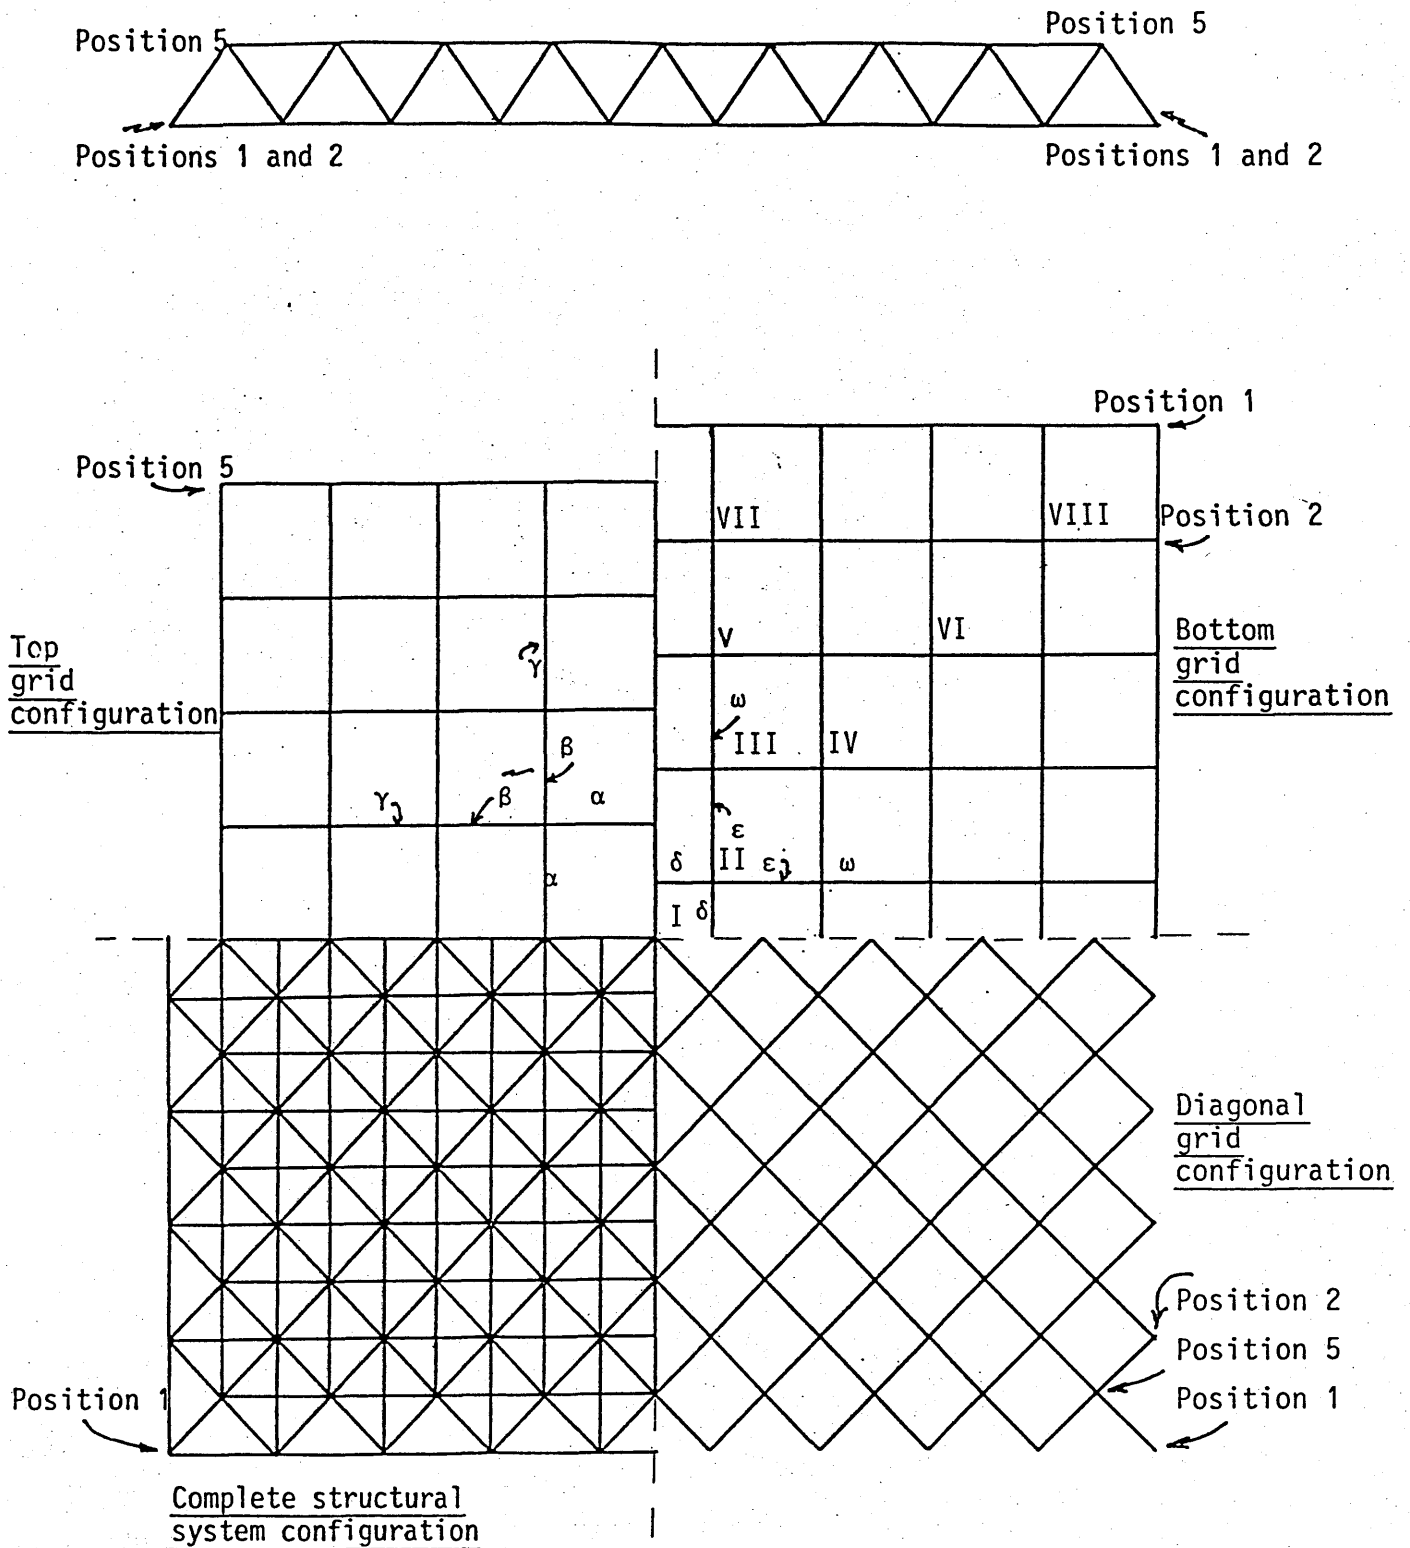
Skeletal Structural System 1. Plan showing the separate layer configurations
